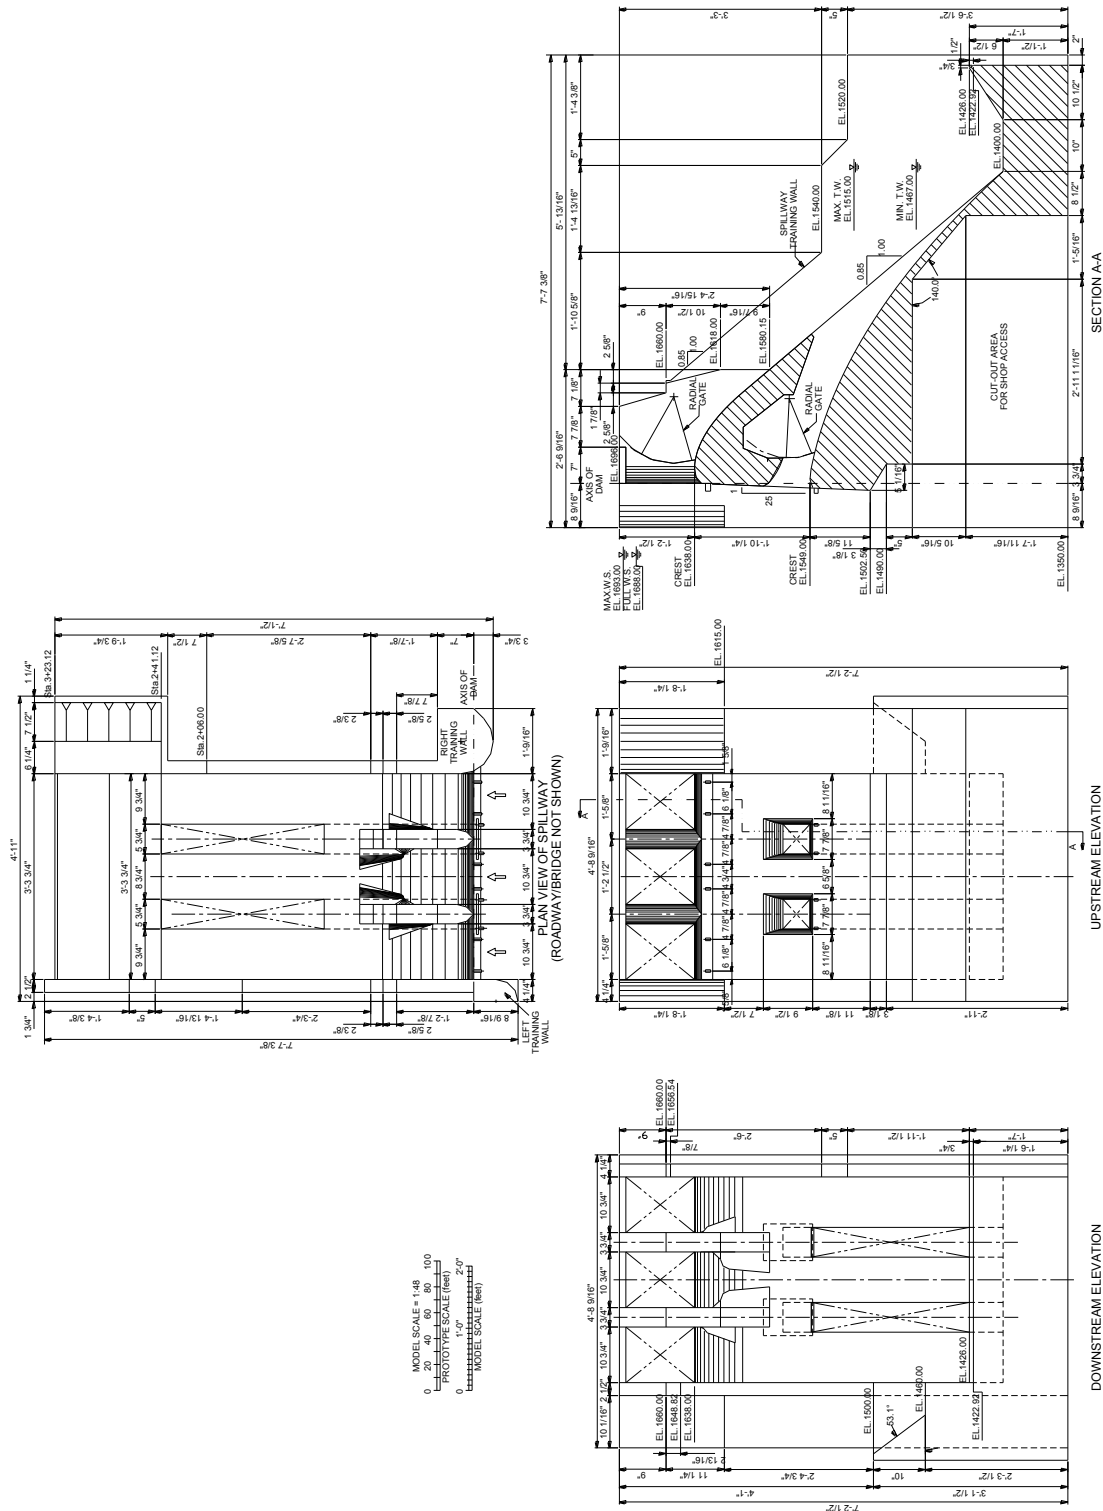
General Plan, Elevation, and Section Through Spillway of 1:48 Sectional Mode
